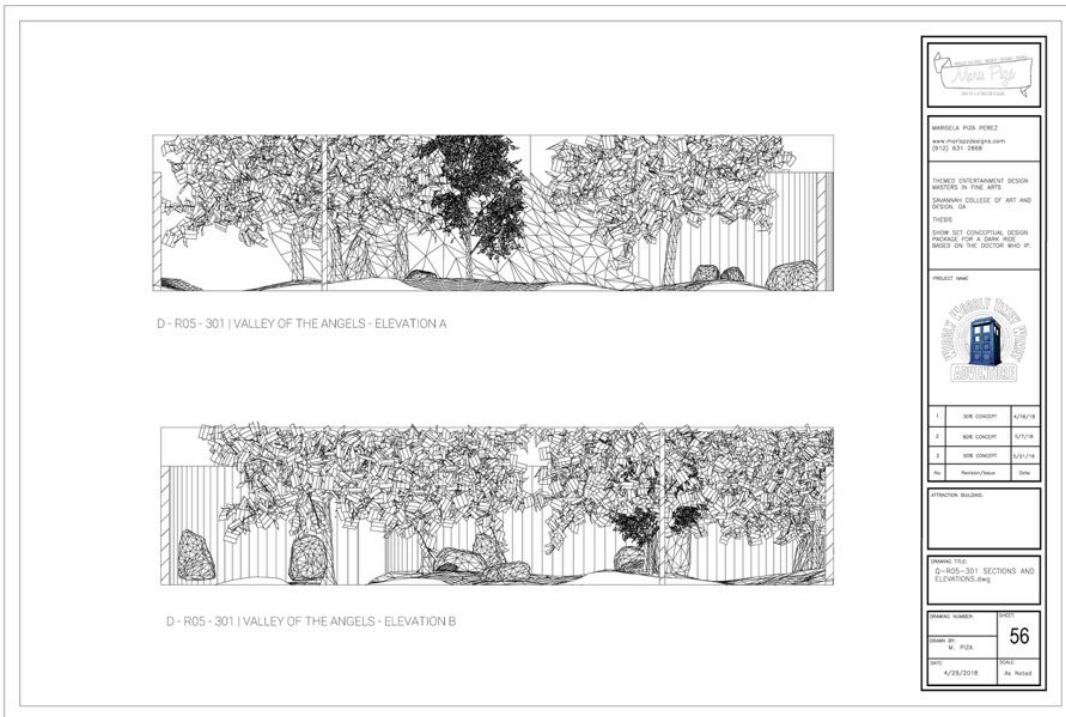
D-R05-301 | Valley of the Angels - Sections and Elevations
